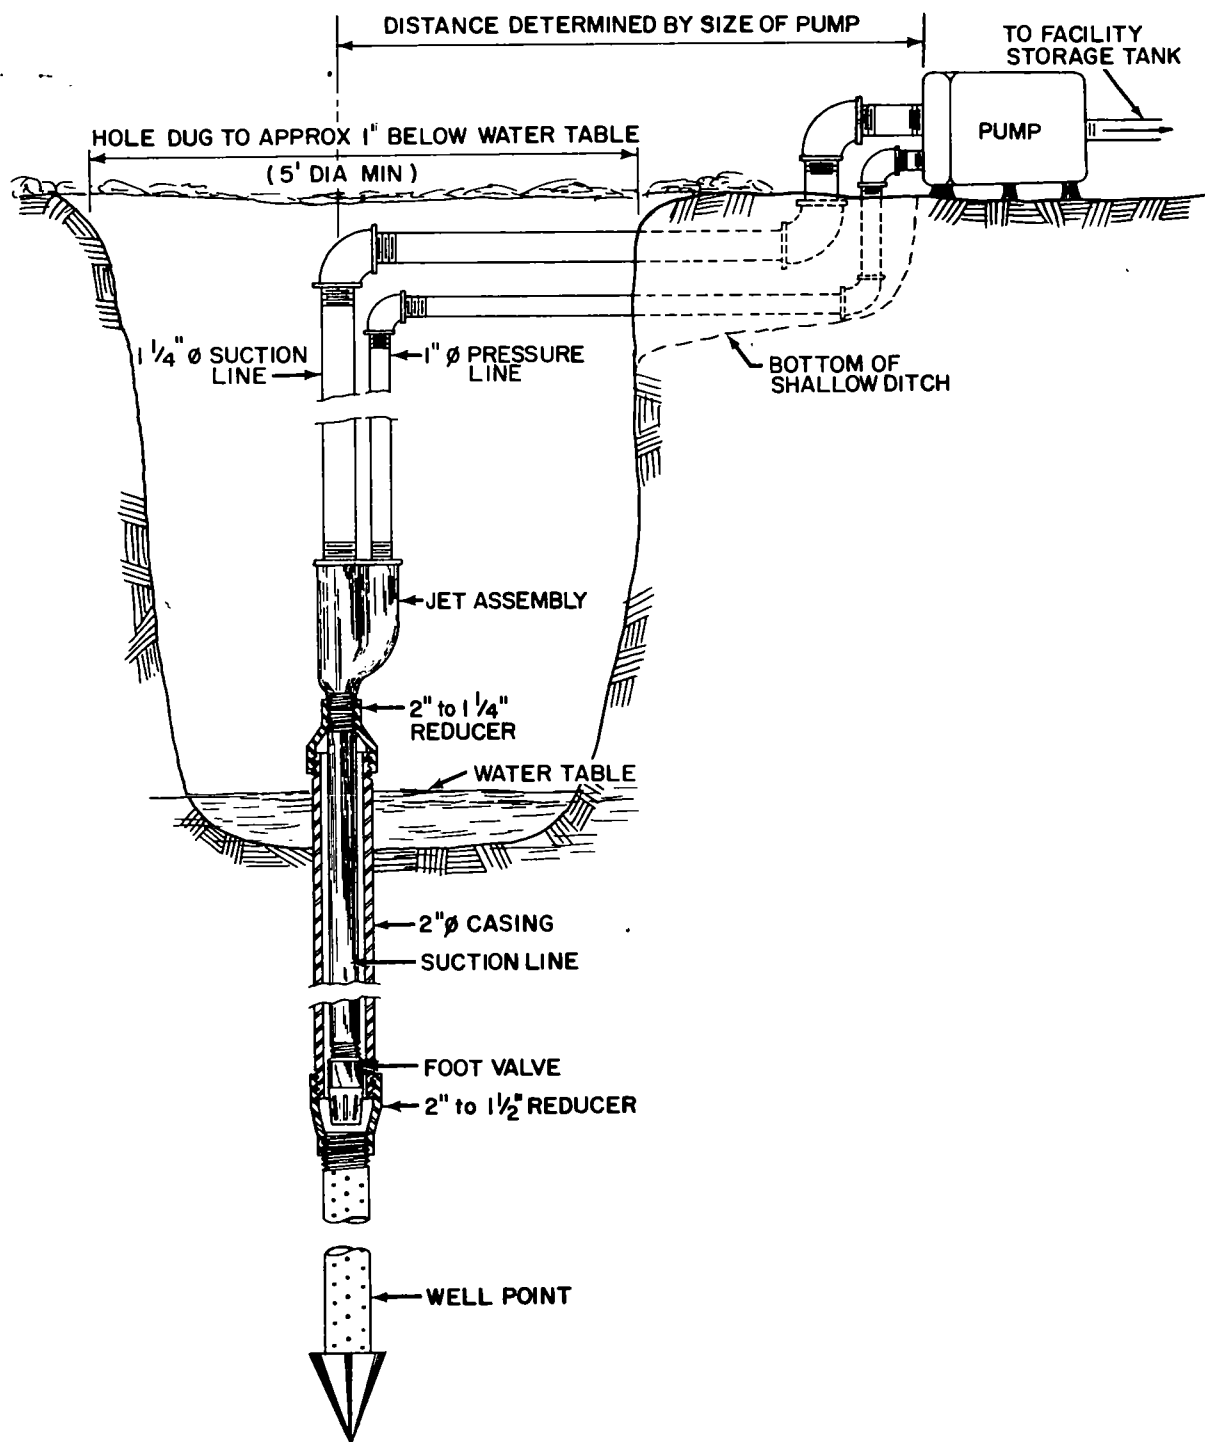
Typical hookup for a deep well using a jet assembly.
